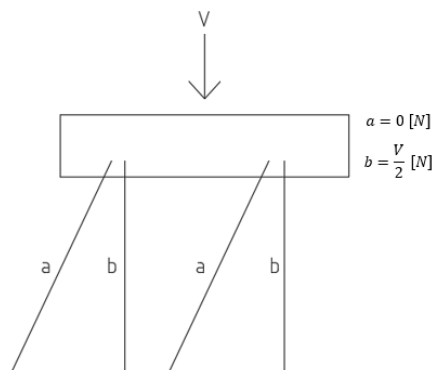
Example of inclined pile placement that can not take vertical forces.
